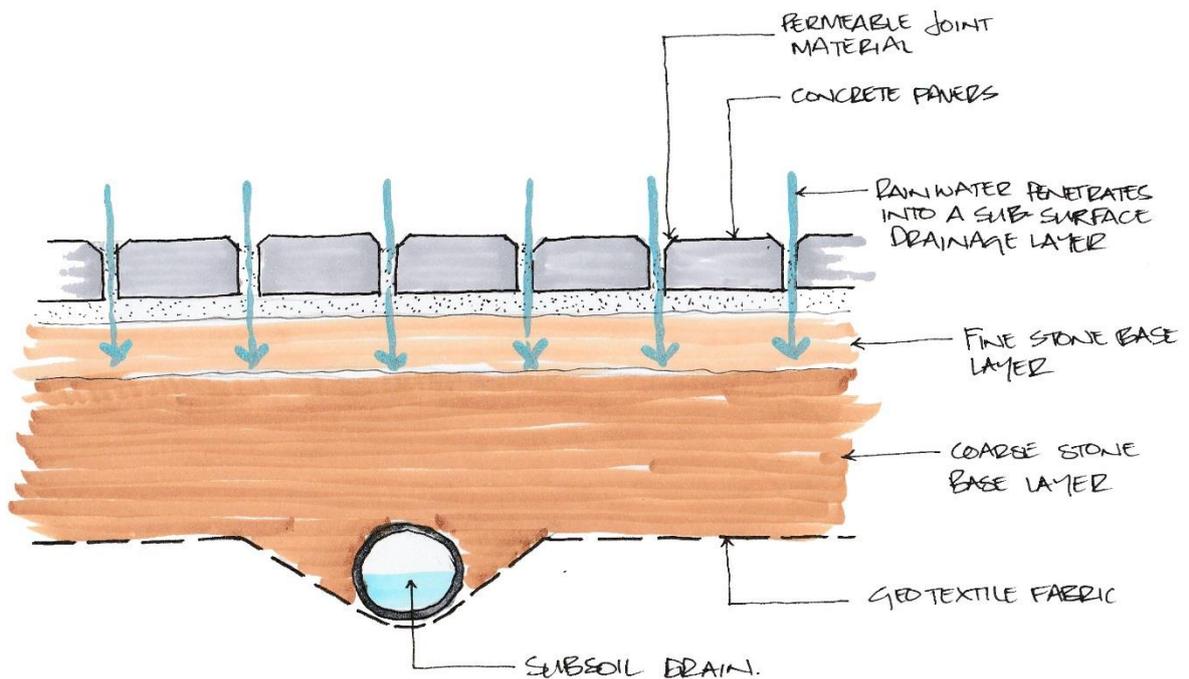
Sketch section of a permeable pavement system that controls surface runoff of rainwater (Source: Author).
